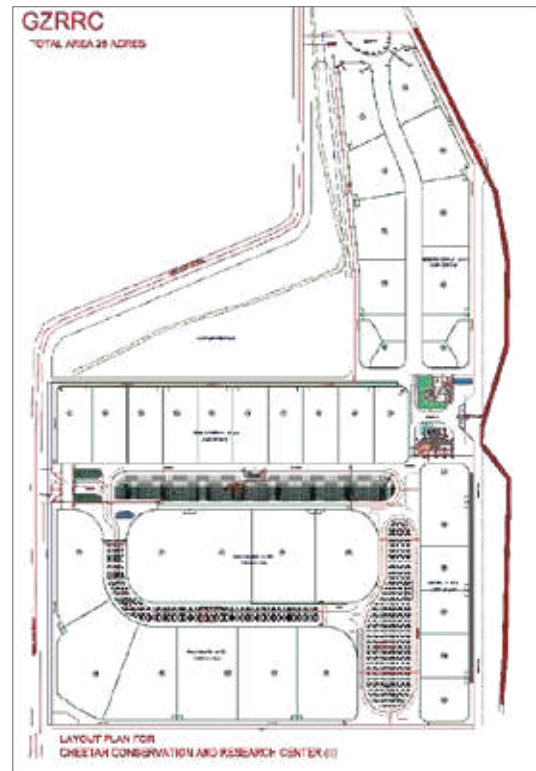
Site plan of Cheetah Breeding Centre at GZRRC
